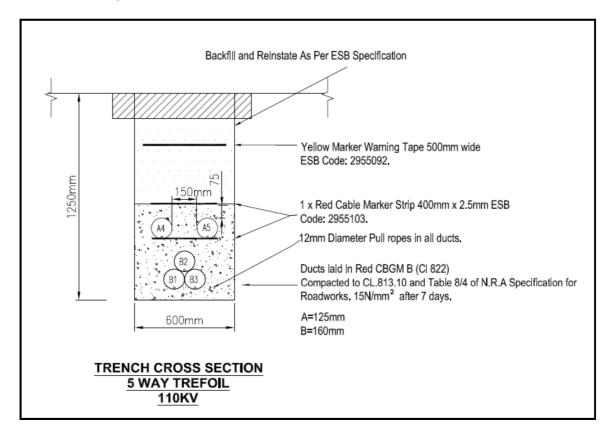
Typical Cross Section of Trench for Underground Cable (Source: CSEA, May 2018)
